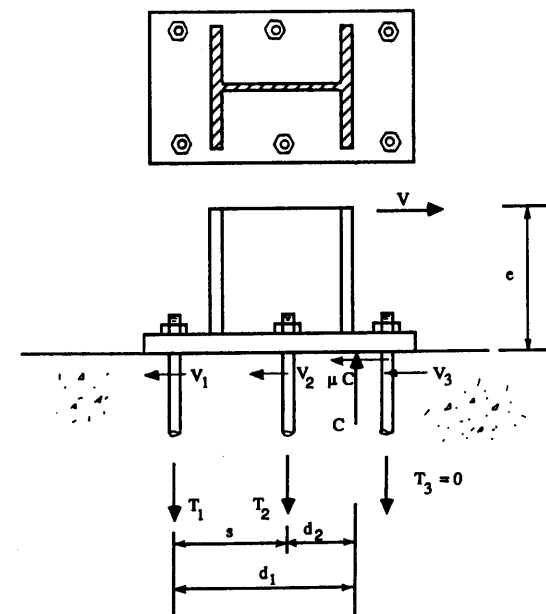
(b). Possible Distribution of Forces on Multiple-Anchor Connections: Flexible Base Plate
